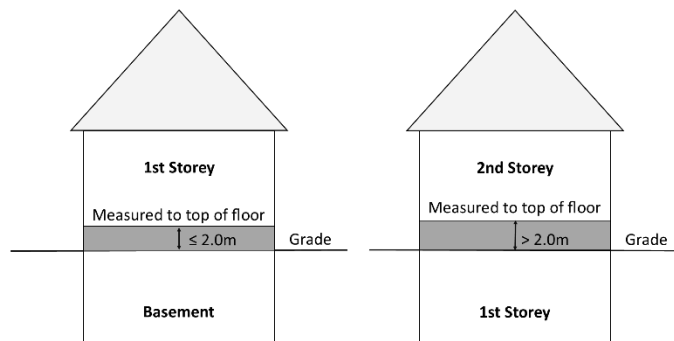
Determining the number of storeys in a building. The building to the left is considered a one-storey building as the top of the upper floor is no more than 2.0m above grade. The building to the right is considered a two-storey building as the top of the upper floor is more than 2.0m above grade.
